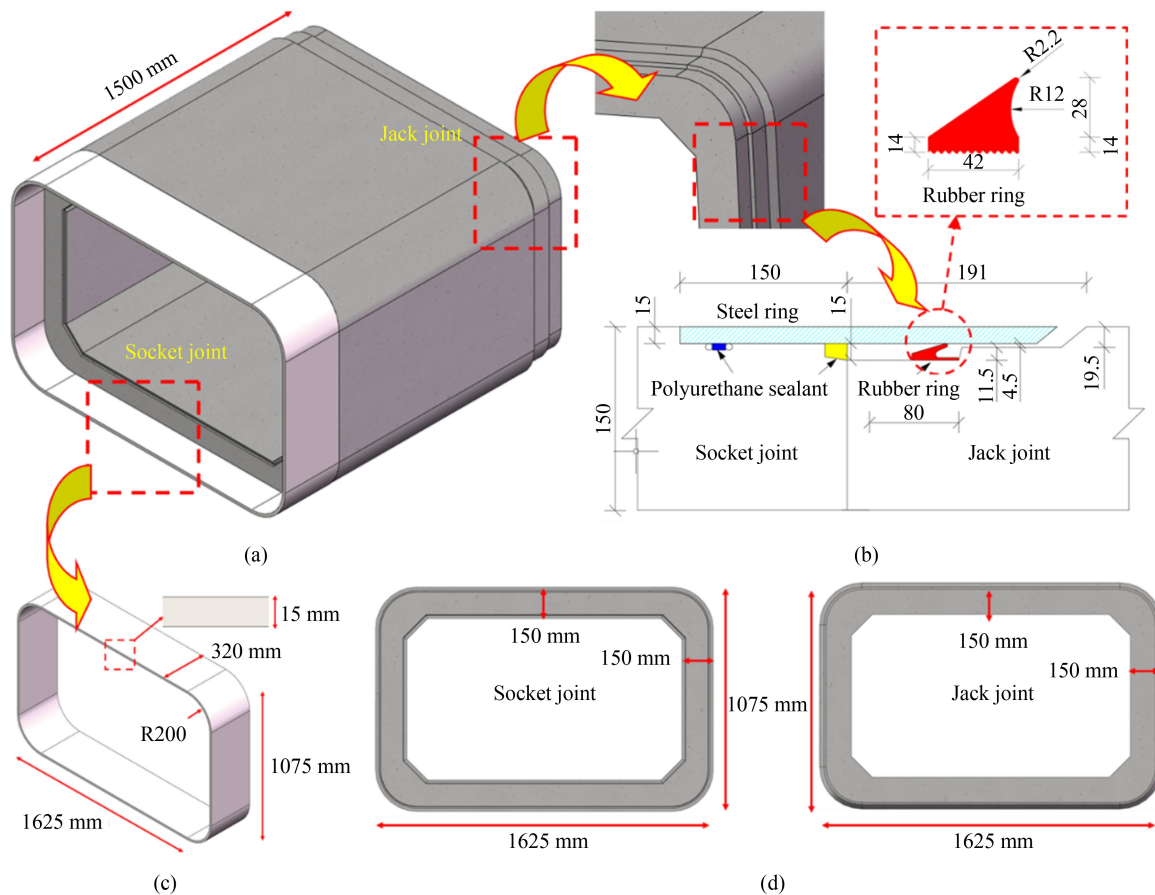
Joint configuration: (a) rectangular pipe-jacking; (b) local structure for rectangular pipe-jacking; (c) steel ring; (d) socket and jack joint.
